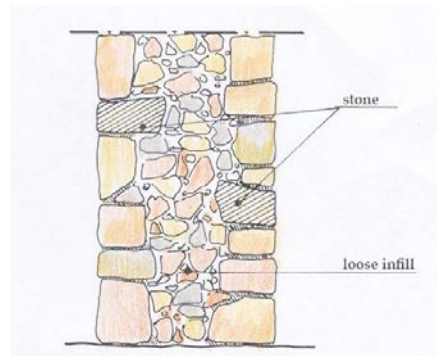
Typical transversal vertical section of a three-leaf “a sacco” masonry wall
